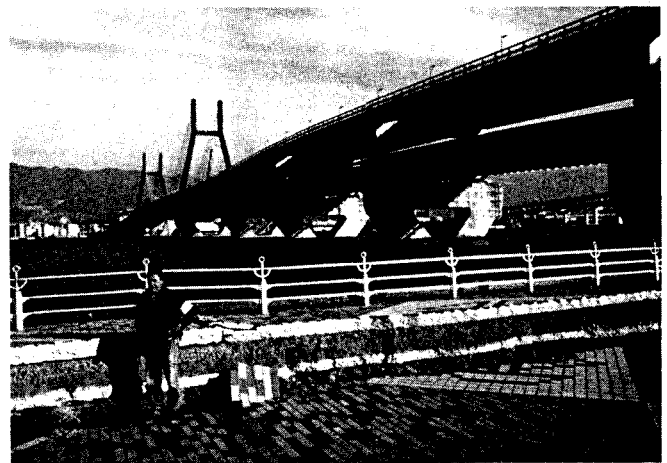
Ground settlement behind quay wall on the Rokko Island side adjacent to Rokkoliner Bridge.
